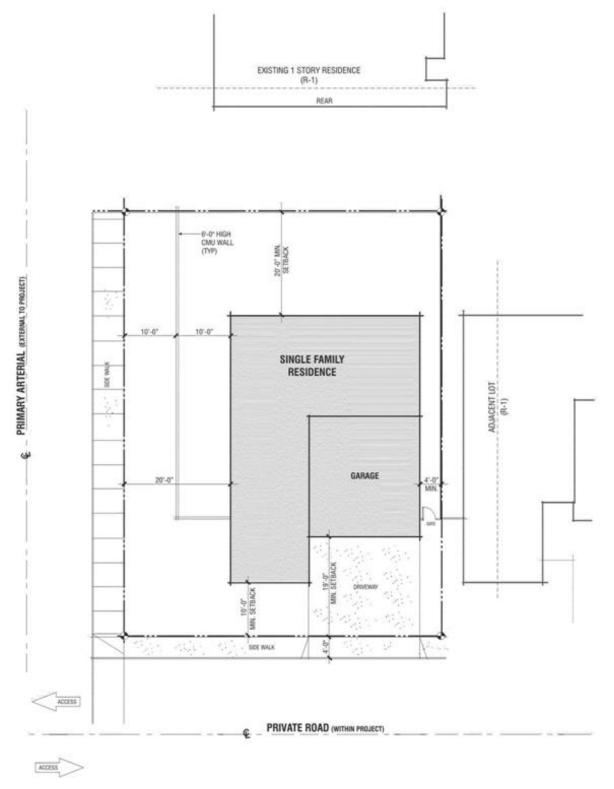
Diagram indicating building setbacks for the following: dwelling rear yard setback adjacent to a
